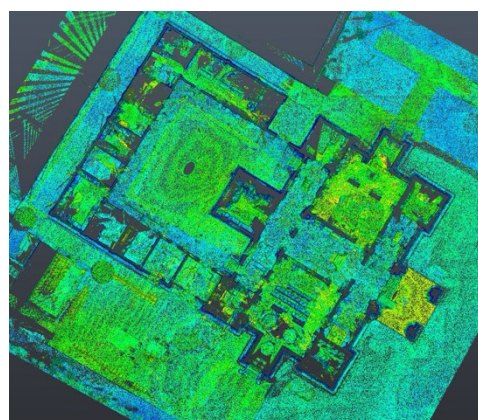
Plan view of LiDAR scan for Bangunan Dato' Jaafar.
